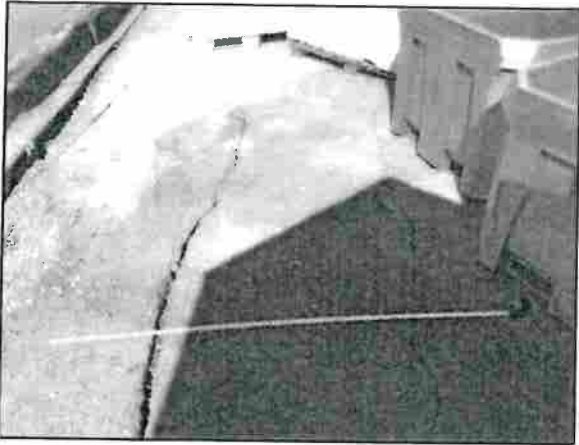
Progression of pavement cracking behind the wall.
